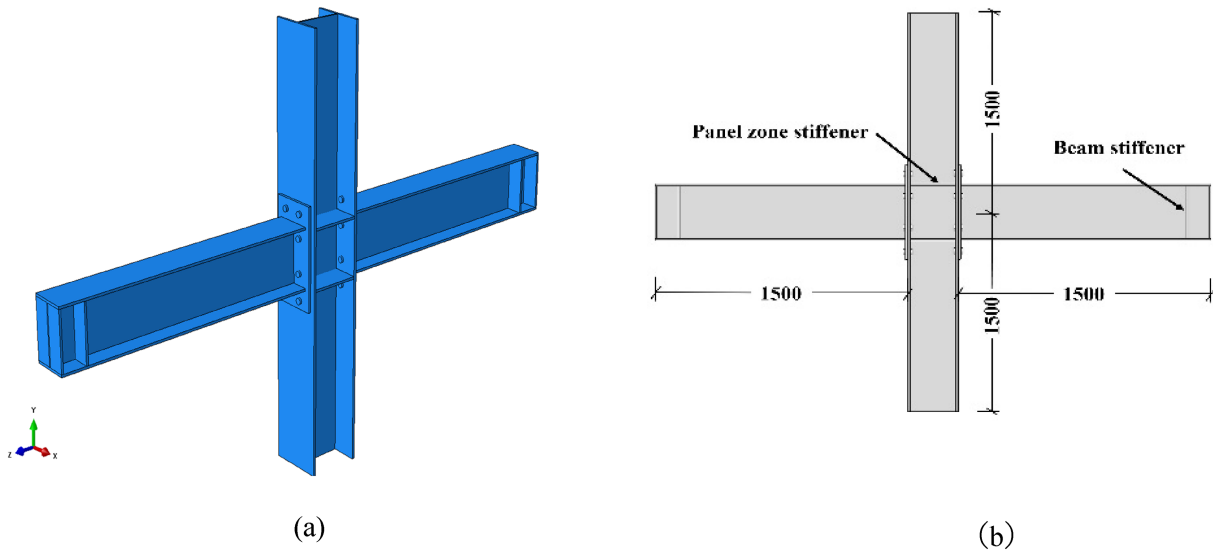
| Model Assembly: (a) 3-D representation and (b) IBCJ dimensions.
